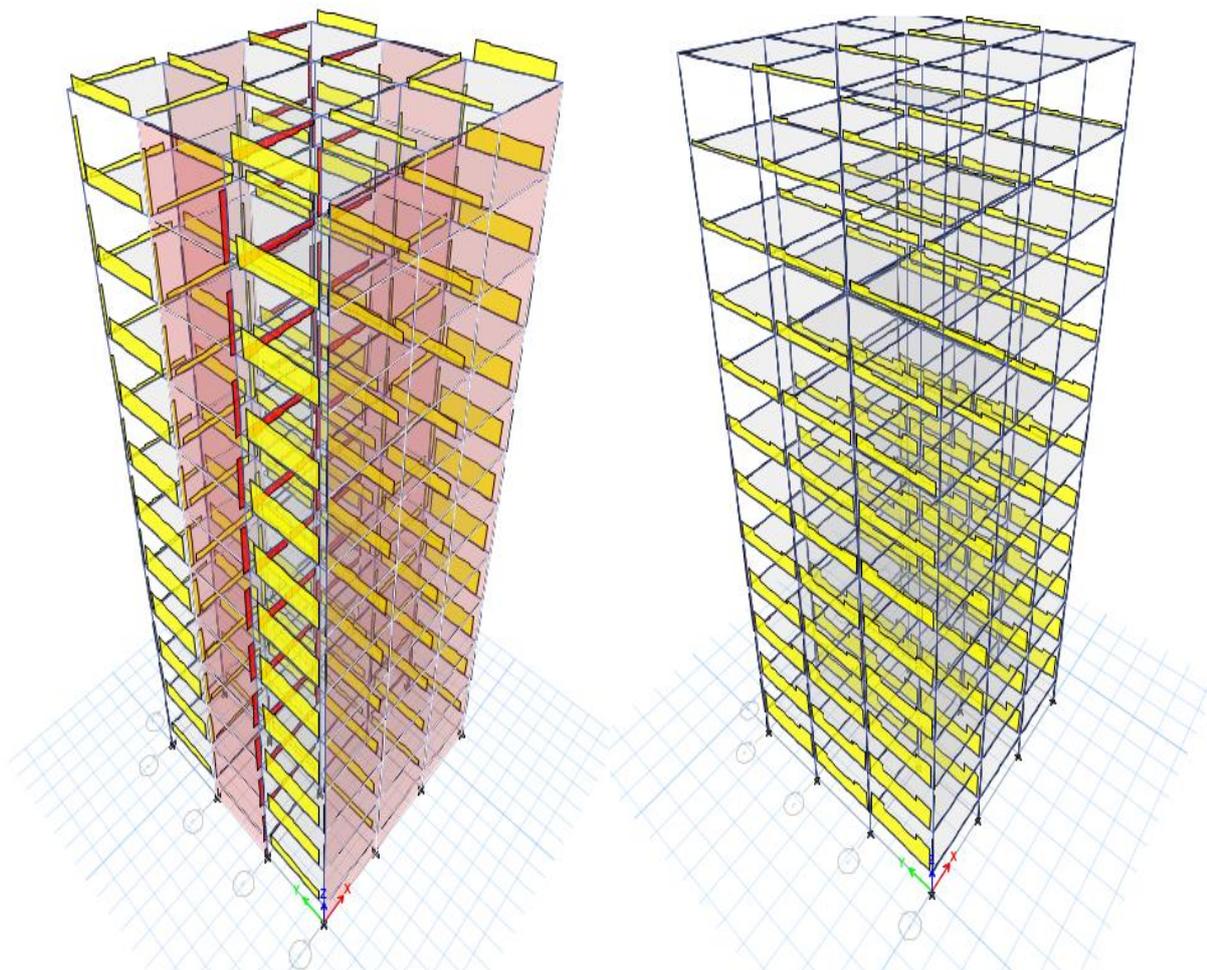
Shear force diagram of Steel concrete composite structure and RCC structure.
